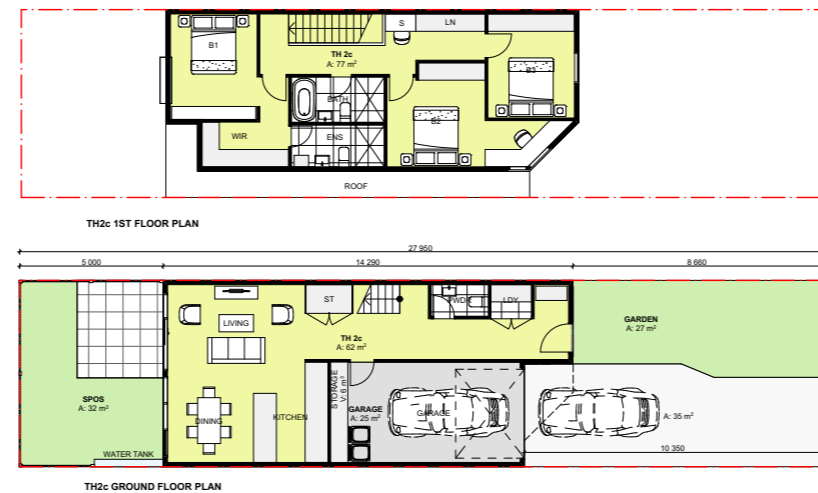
Townhouse Type 2c (Source: Plus Architecture)
